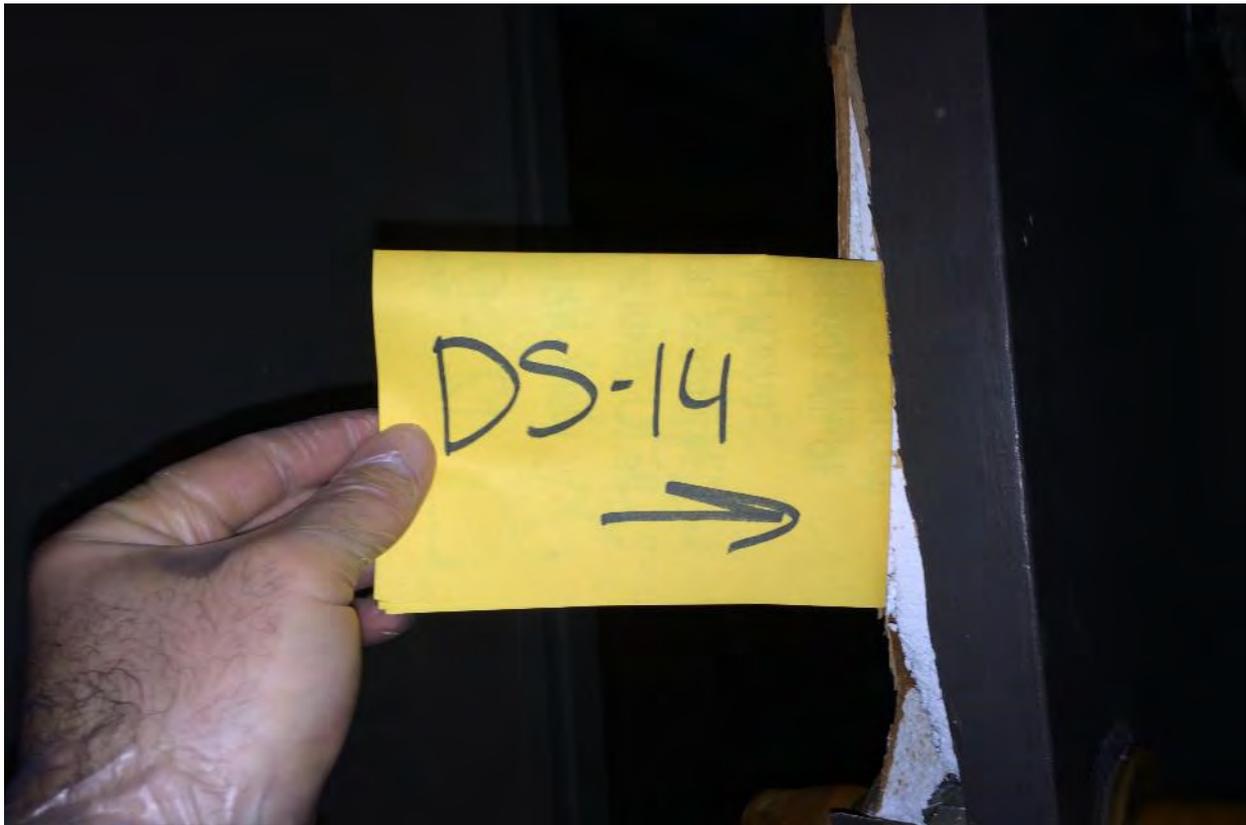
Laboratory analyses detected 60% chrysotile asbestos and 30% amosite asbestos within central room fire door sample DS-14 collected from the Dormitory Building central room door.
